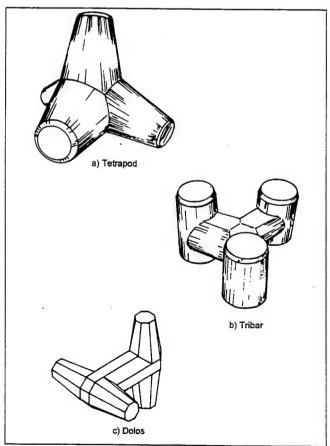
Precast Concrete Armor Units used in Jetties, Breakwaters, and Groins.
